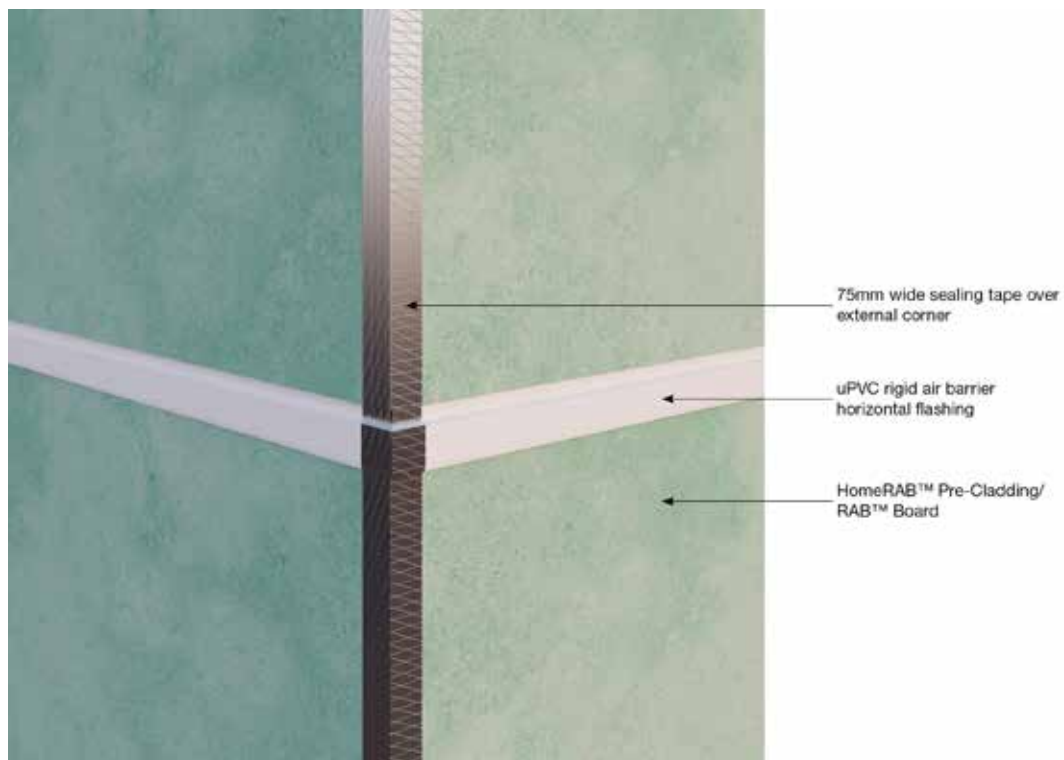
RAB Board used as backing board for stucco plaster/proprietary cladding systems
